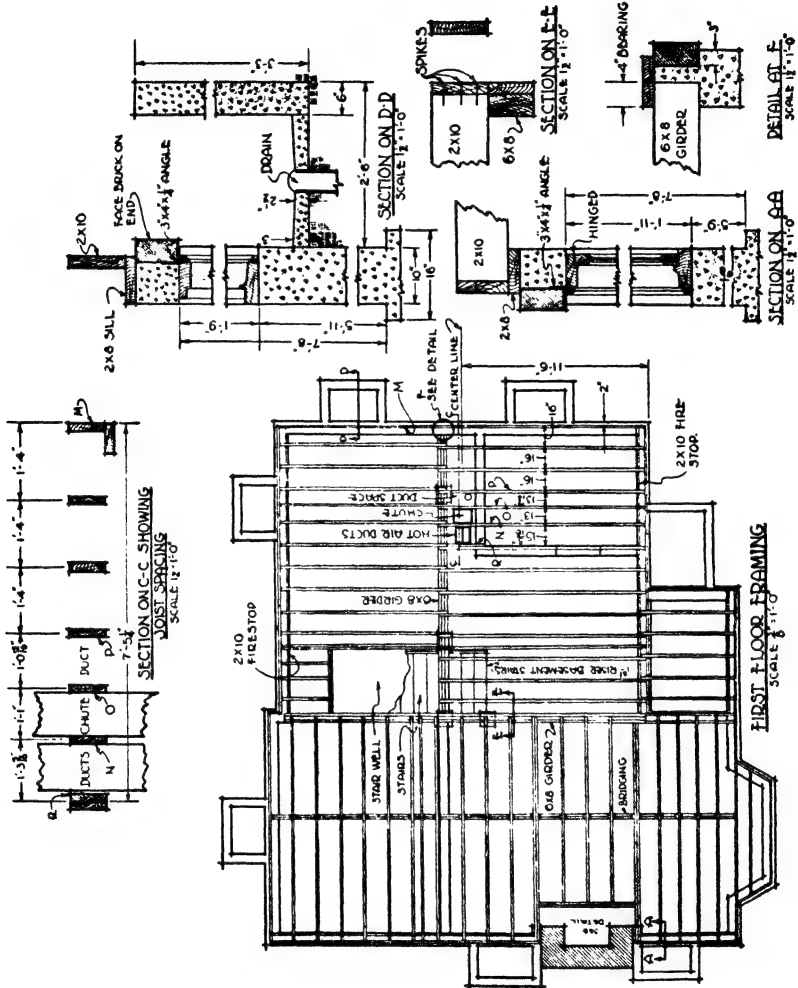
First Floor and Basement Framing Details for Cox Residence
